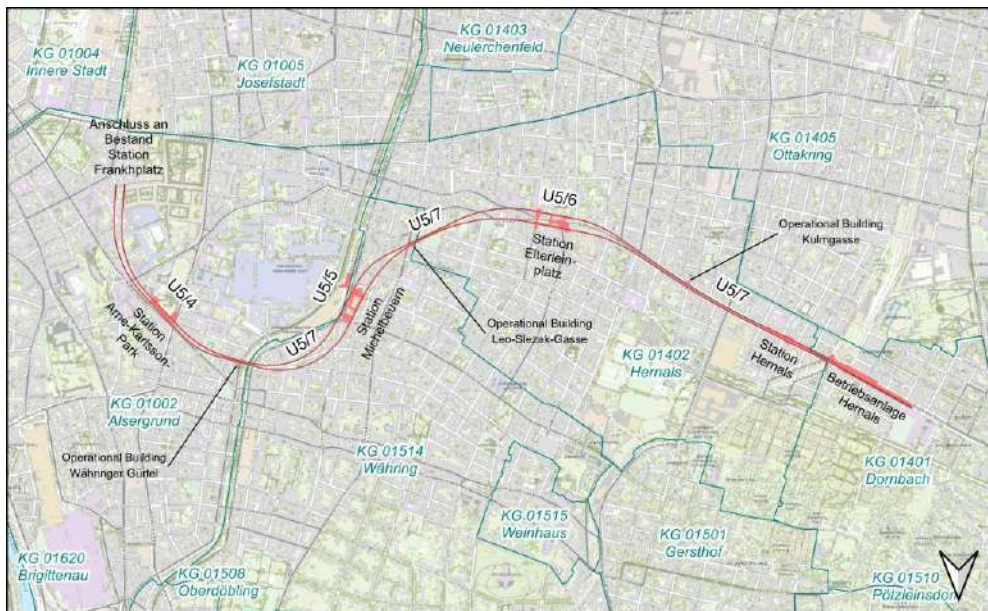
Overall Site Plan U5 second section (Source: IGT Geotechnik und Tunnelbau).
